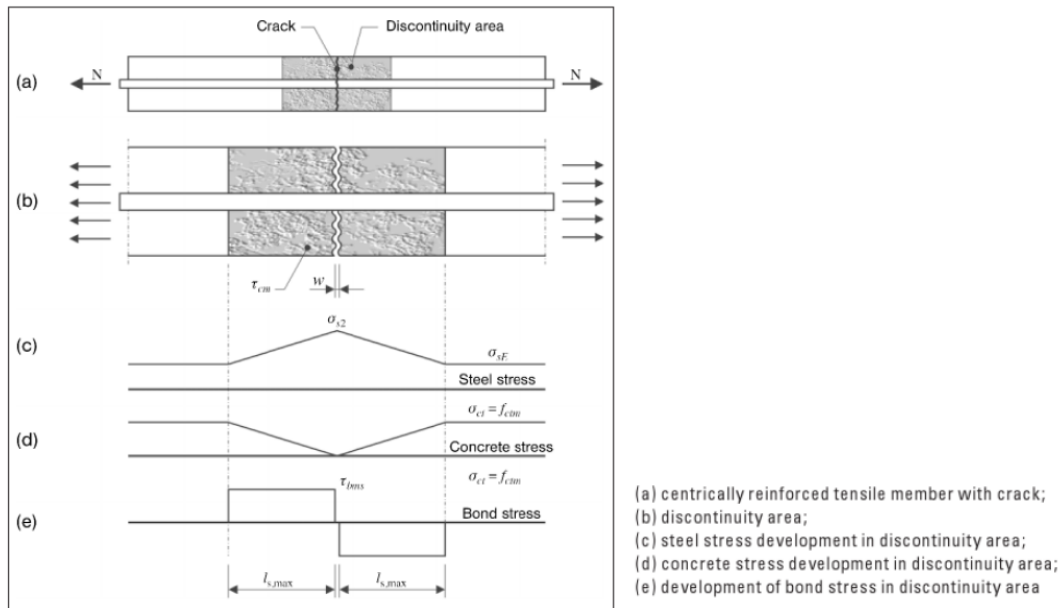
; Stresses in the crack formation stage (International Federation for Structural Concrete, 2013, p. 284)
